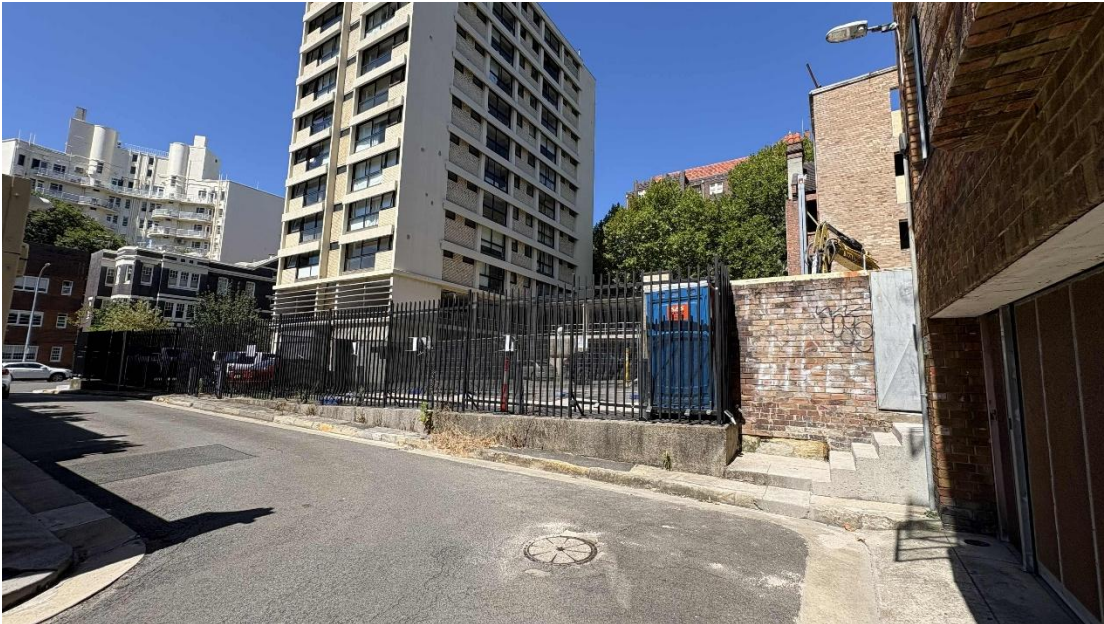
Subject site from McDonald Ln (subject site centre) (Photo taken: 24/01/2026)
